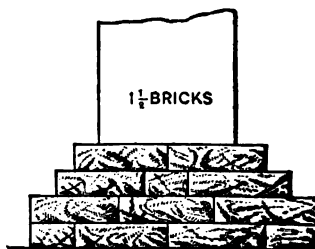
Brick Footing. Wall One-half Bricks Thick
